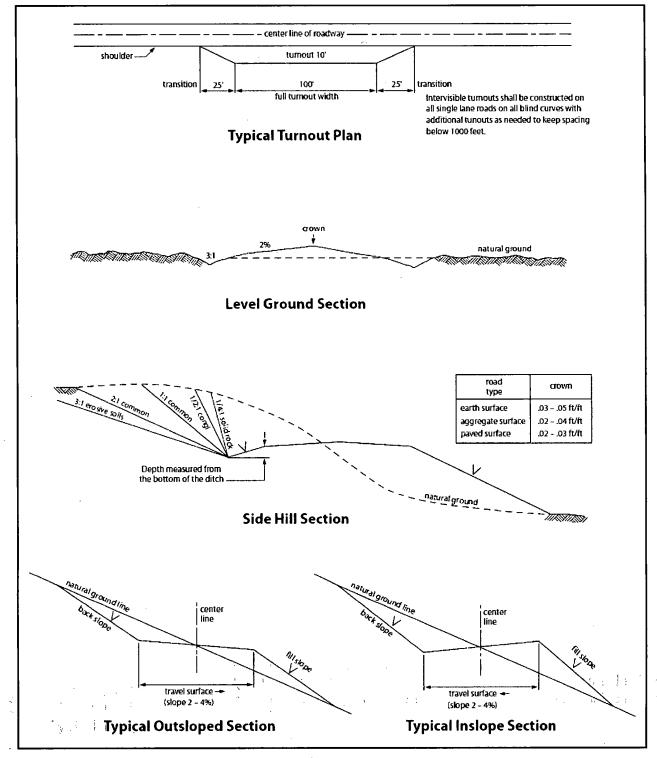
Cross-sections and plans for typical road sections representative of BLM resource or FS local and higher-class roads.
